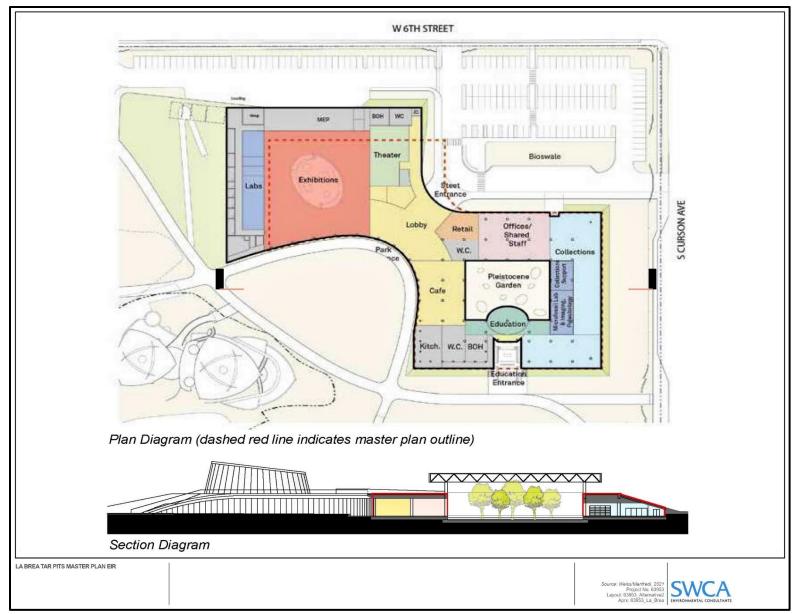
Alternative 2: Museum plan and section diagrams.
